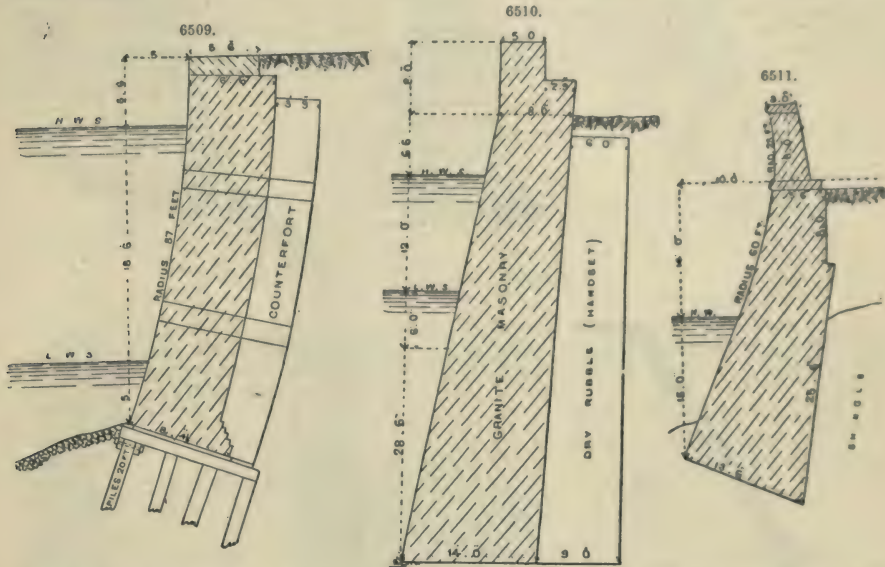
is the section of the sea wall at Penmaen Maur, by Robert Stephenson. The facing is of limestone ashlar, set in cement, for 18 in. inwards from the face. This section was adopted after failures.
